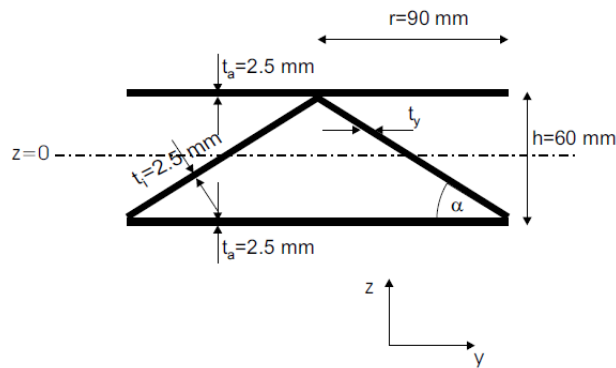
Example of cell geometry when calculating Youngs Modulus for a floor made of extruded plates (Kohrs, 2002)
